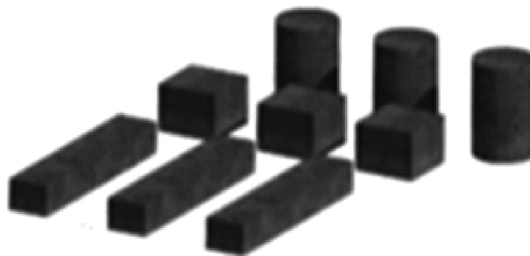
Specimens of Concrete (Cylinder, Cubes, Prisms)
